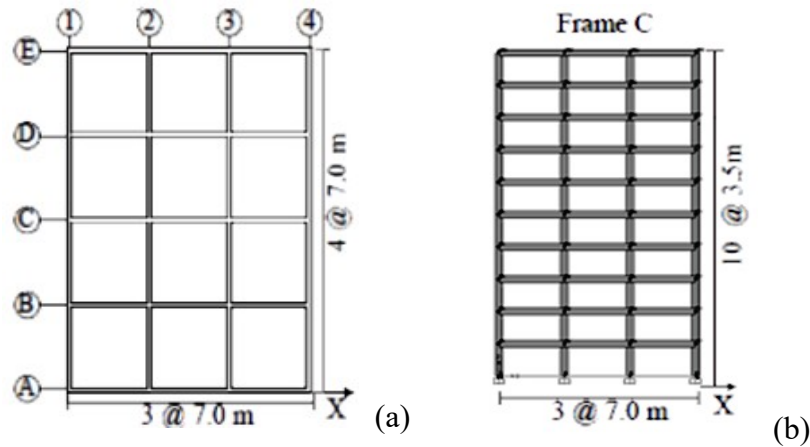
Typical plane (a) and elevation (b) benchmark model (modified from [38],[50]).
